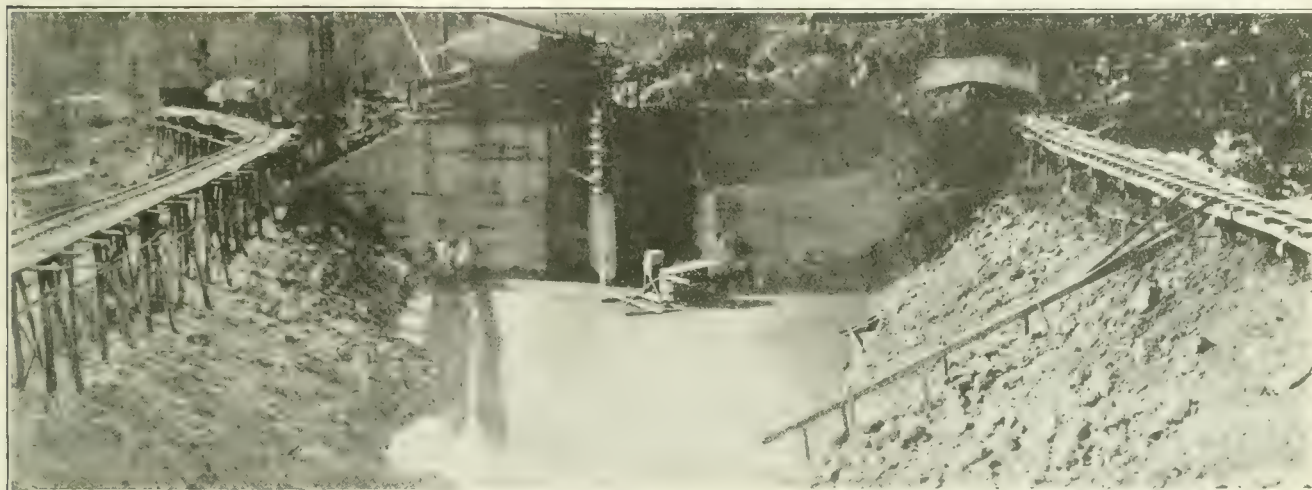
RETAINING WALL AT WEST END OF DAM SHOWING TRESTLES FROM WHICH EARTH WAS DUMPED
